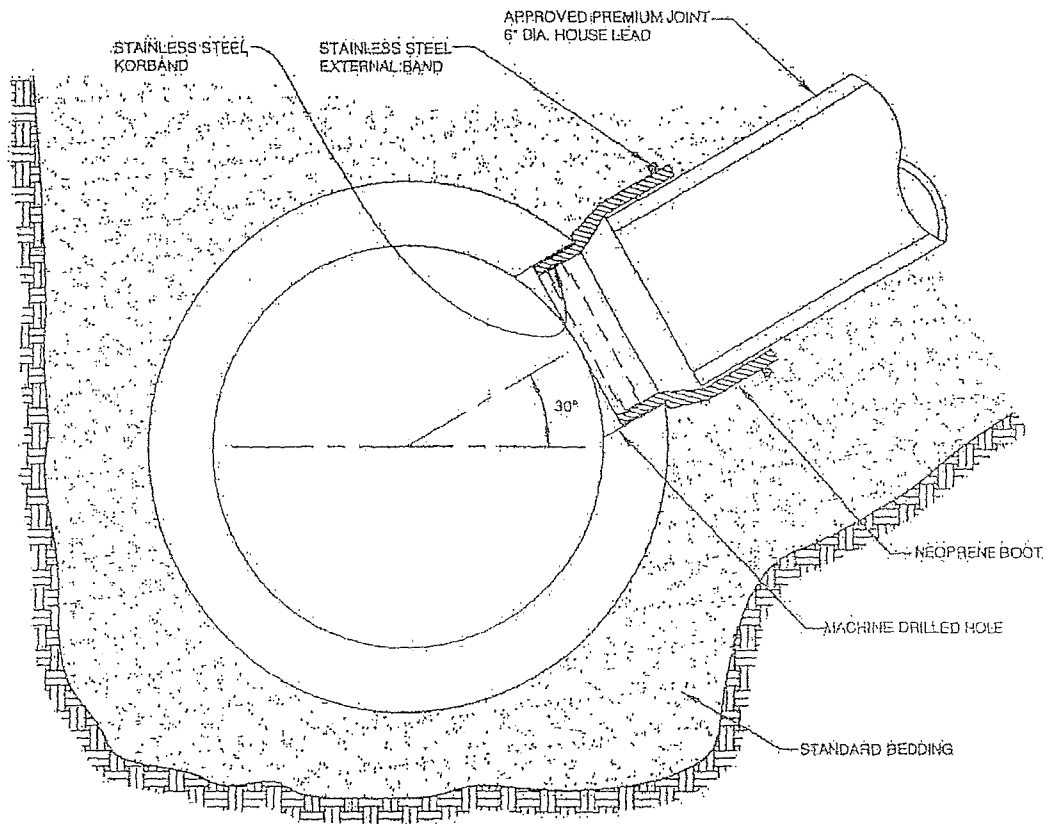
DETAILS OF HOUSE LEAD CONNECTIONS TO MAIN SEWER
